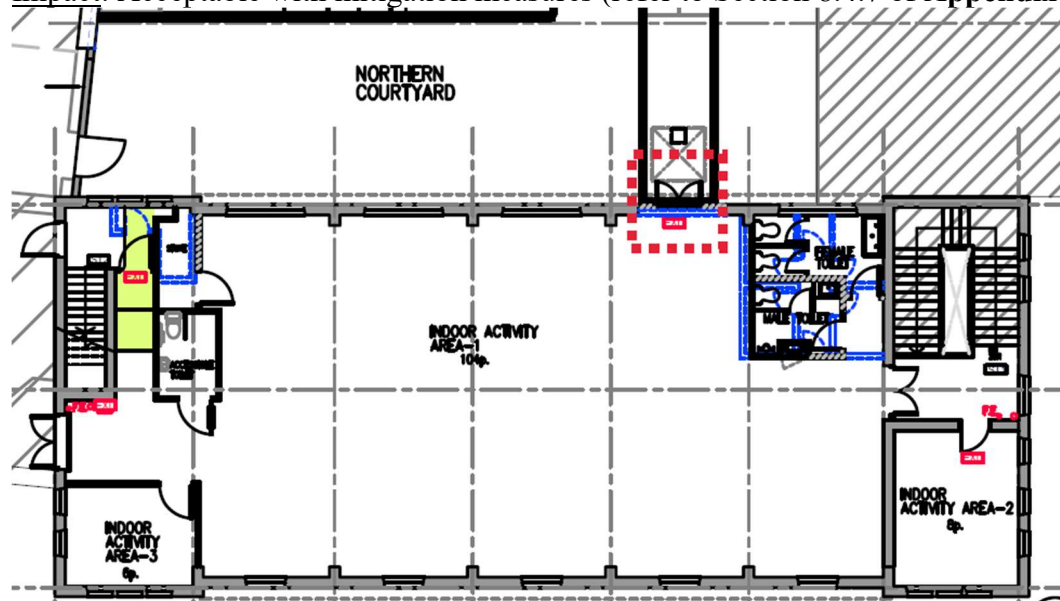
Location of Proposed New Door Opening at 1/F (red dashed line)
